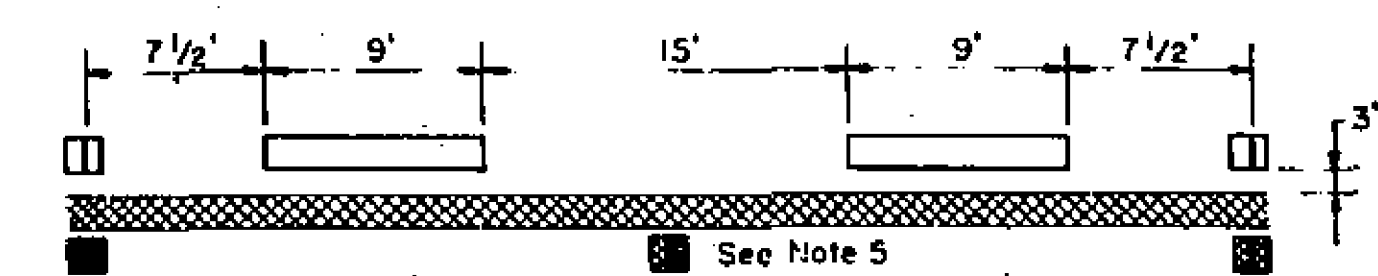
LANE LINE ON MULTILANE UNDIVIDED HIGHWAYS
